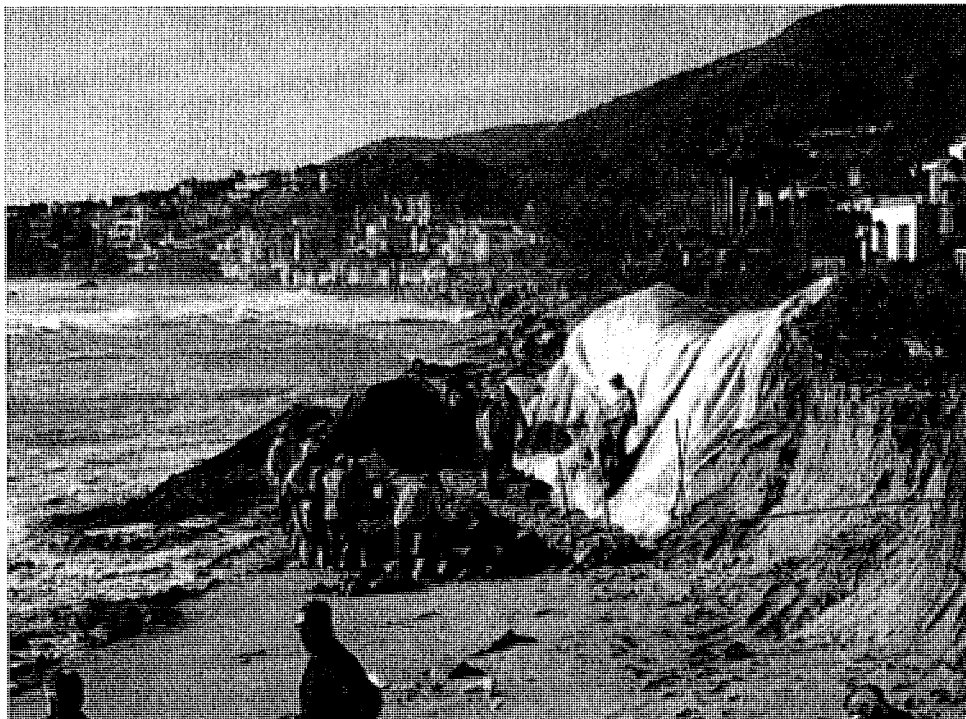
Severe Erosion and Dune Damage at West Broad Beach (January 2010)
